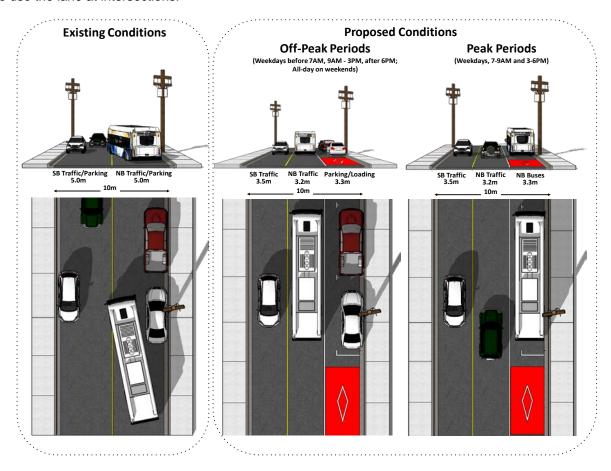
Existing and proposed typical cross section (looking to the north) - Gottingen Street
